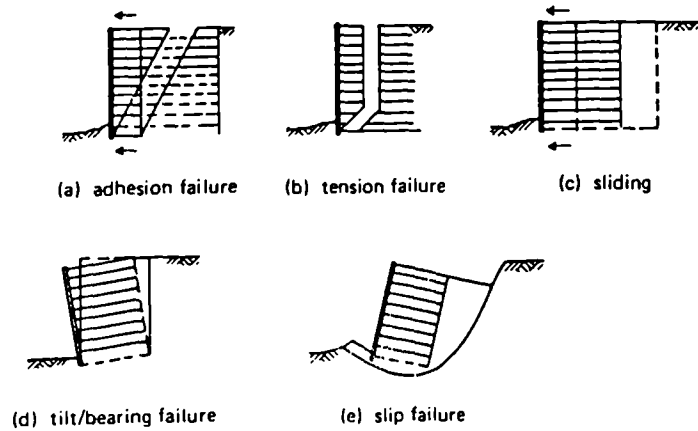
Failure Mechanisms of Vertically Faced Reinforced Soil Structure
